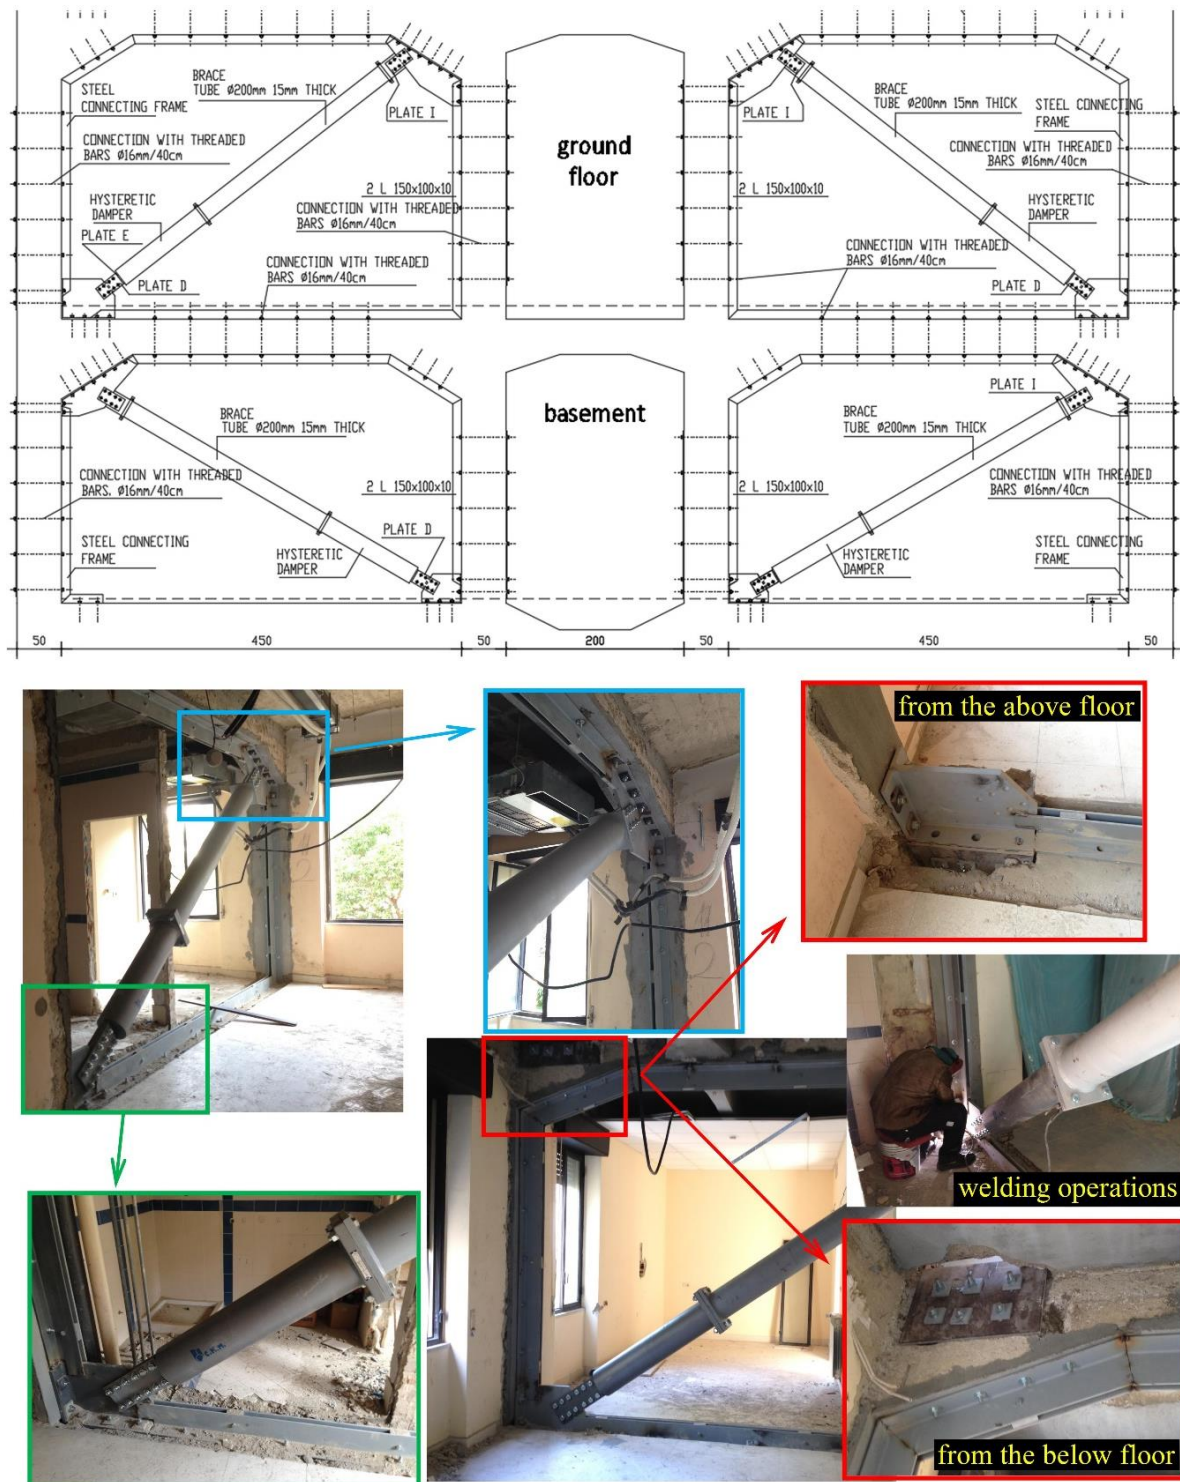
Design drawings detailing the connection of the hysteretic dampers and the masonry structure through added steel frames and photographs of installation stages
